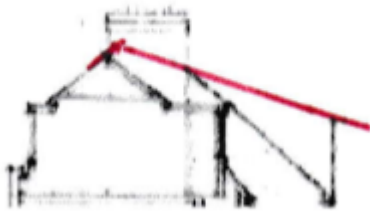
3 Flask Walk section (taken from 1974 drawings) showing roof from NE and new unauthorised construction
